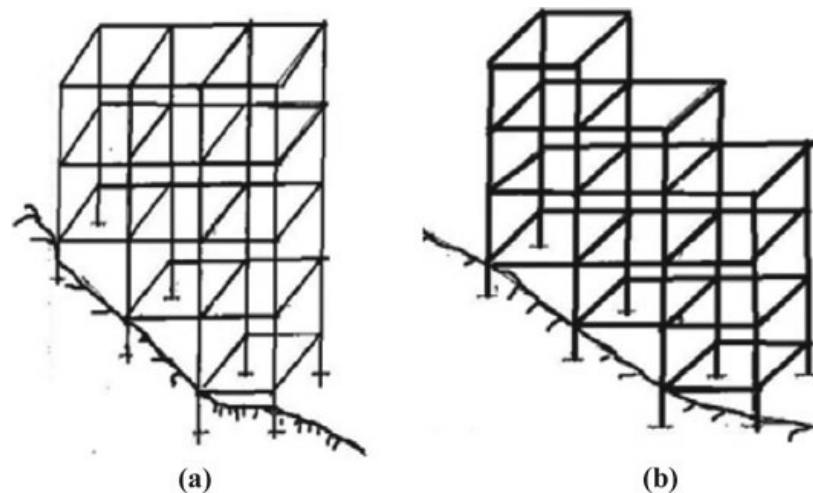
a Step back building. b Set back and step back building [3]
